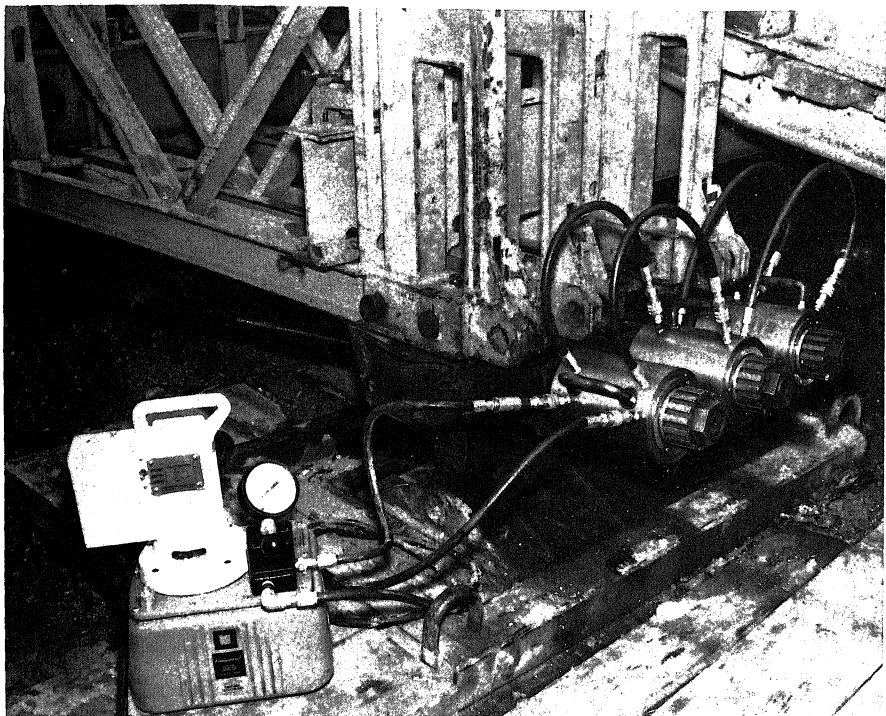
Cable tensioning assembly with electric hydraulic power unit.
